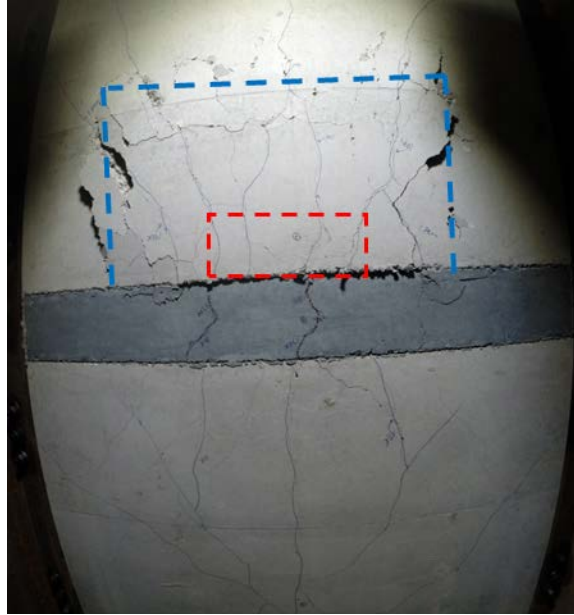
SB-1: Underside of slab following failure loading adjacent to closure strip. (Red indicates load location and blue is exterior edge of punch cone)
